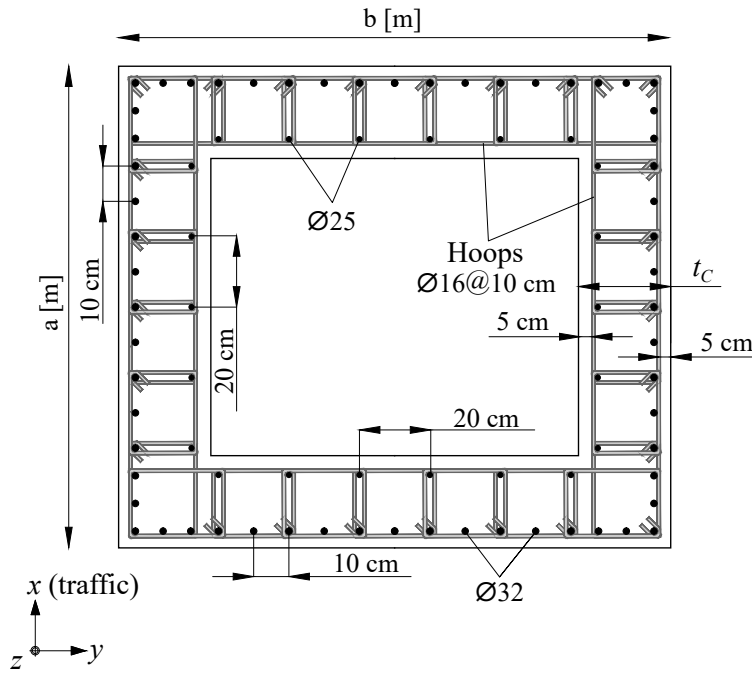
Geometric definition of the pylon cross section with the longitudinal and the transverse reinforcement arrangements.
